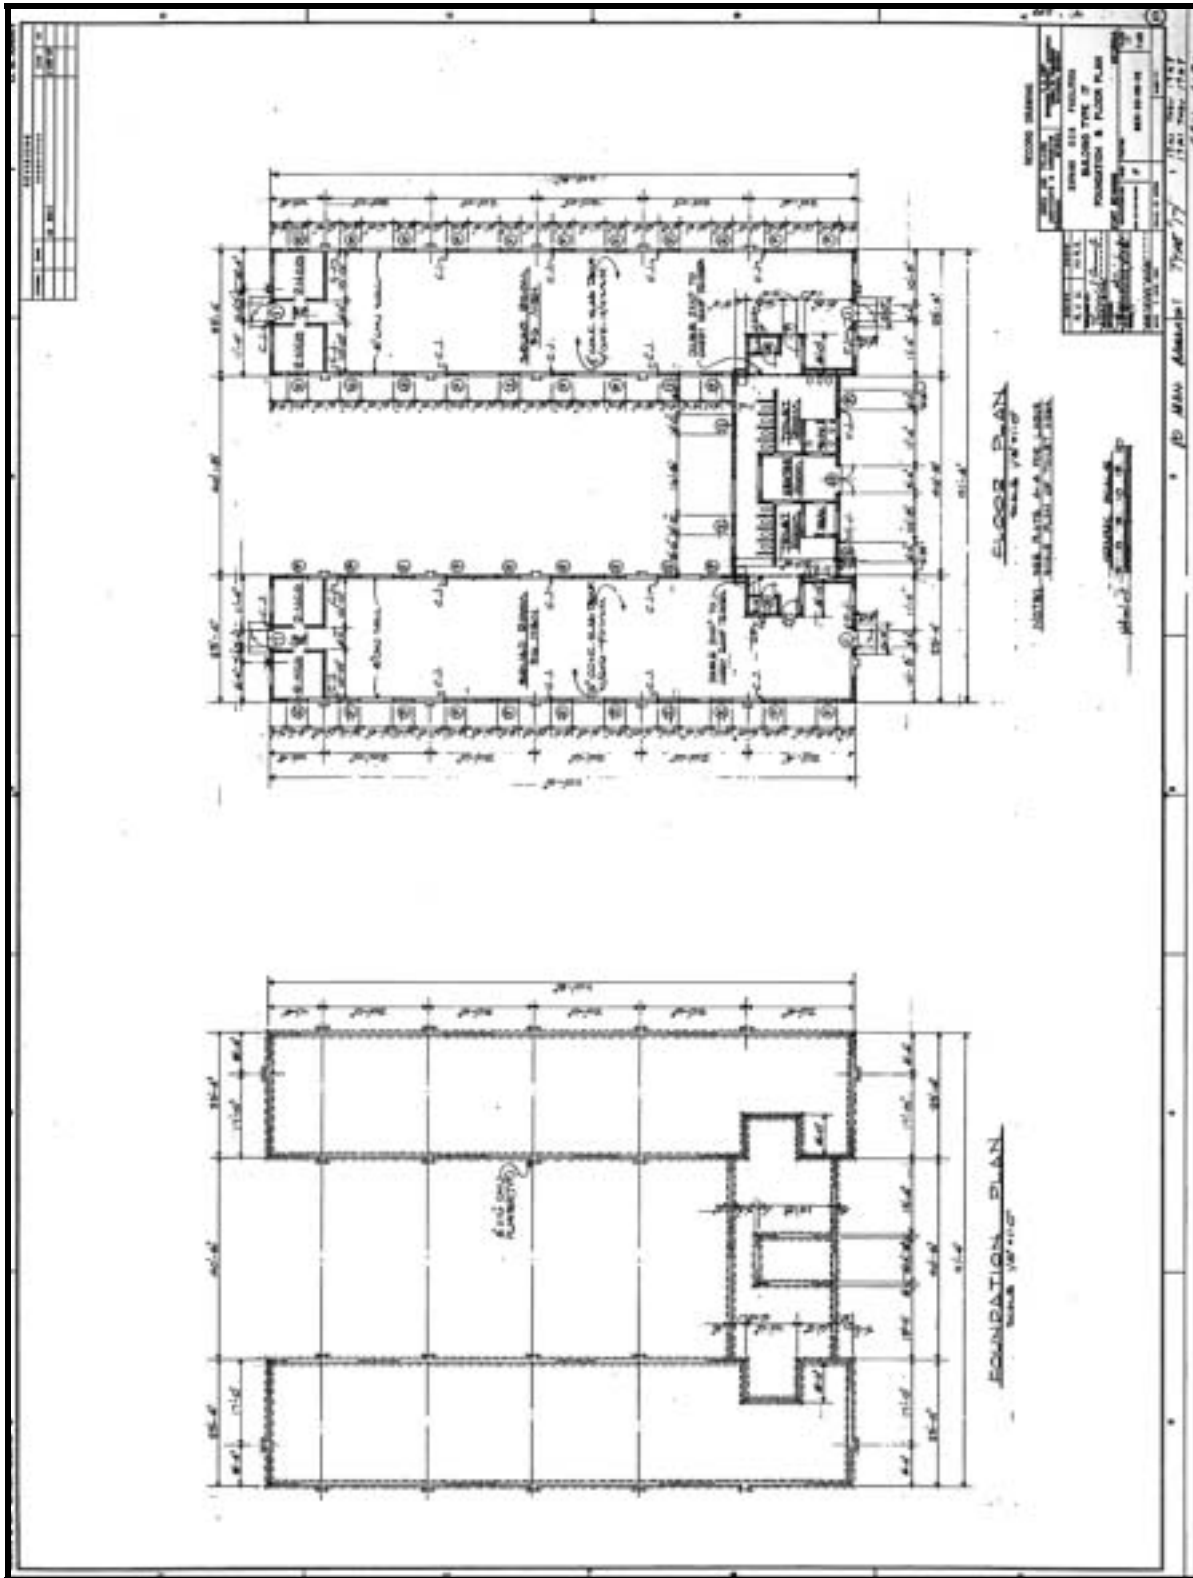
Semi-permanent 72-man “U” barracks, floor plan, Ft. Benning (1964, as built 1967) (Engineering, Ft. Benning).
